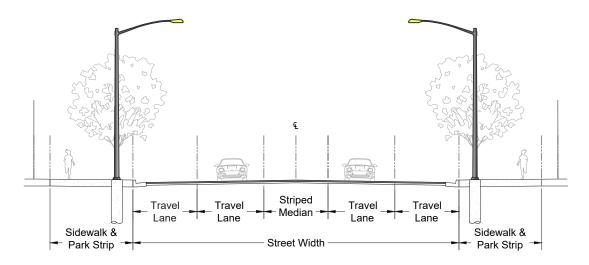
Typical Collector Street with Non-Continuous Lighting Cross Section
